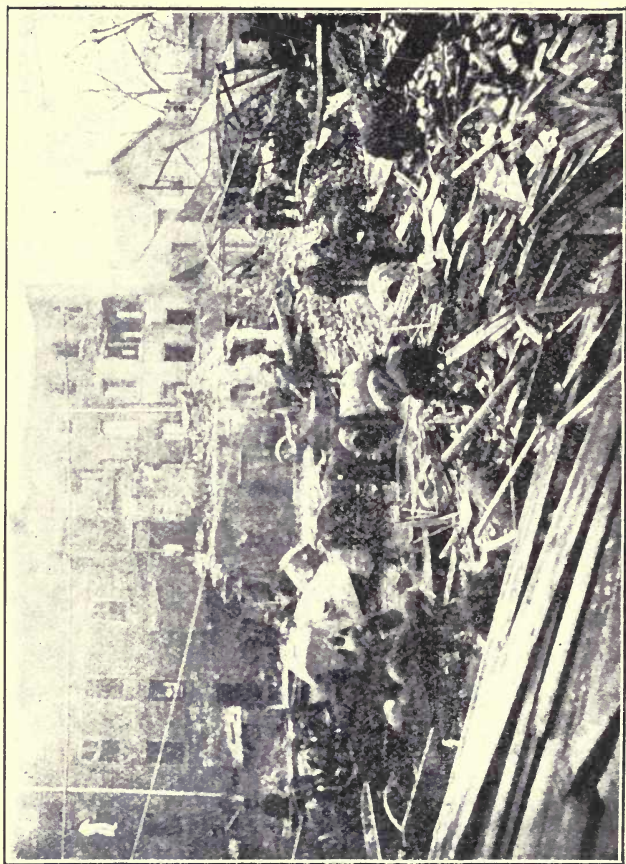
A.—RESULTS OF EXPLOSION OF TUBULAR BOILER
